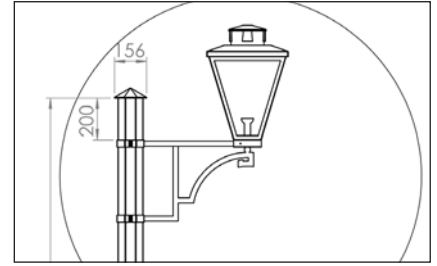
This type of street lamp can be used on Lindegade, Nørregade, Museumsgade, Kirkegårdsallé and a section of Kongensgade.
